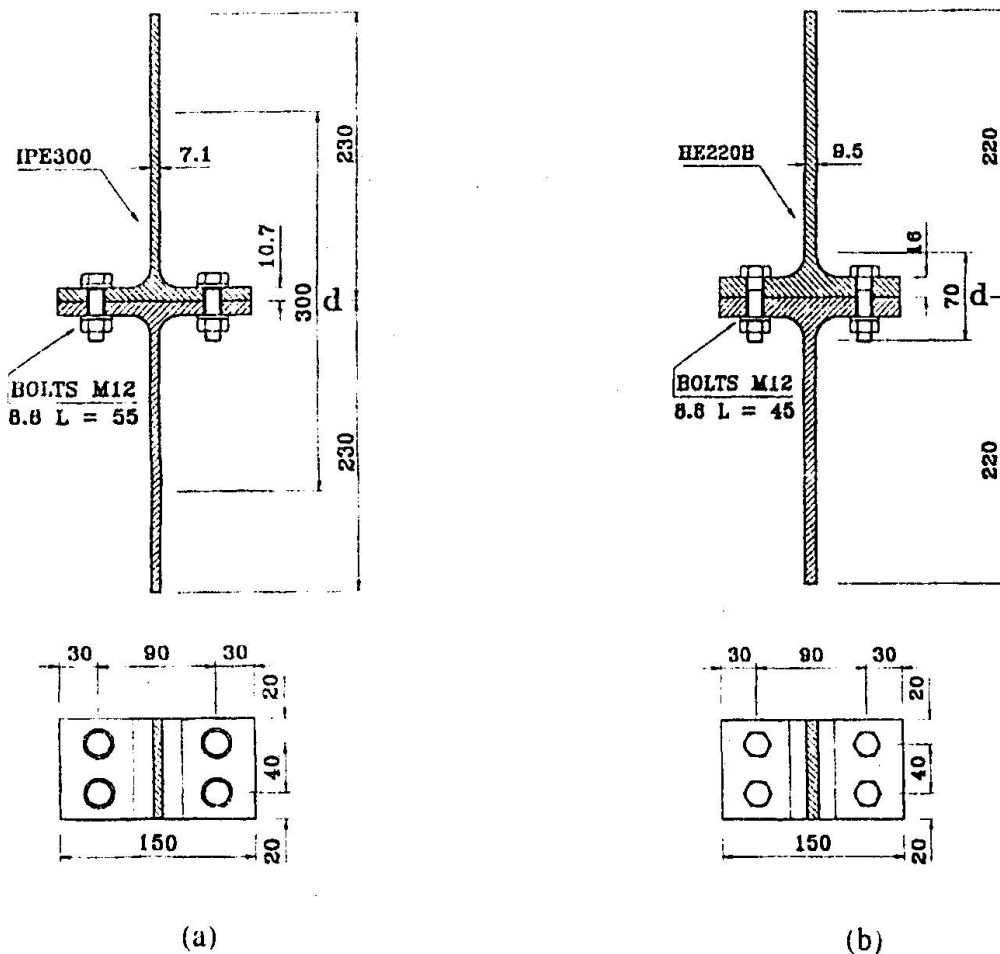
Test specimens: (a) tee-stub connection T1; (b) tee-stub connection T2
